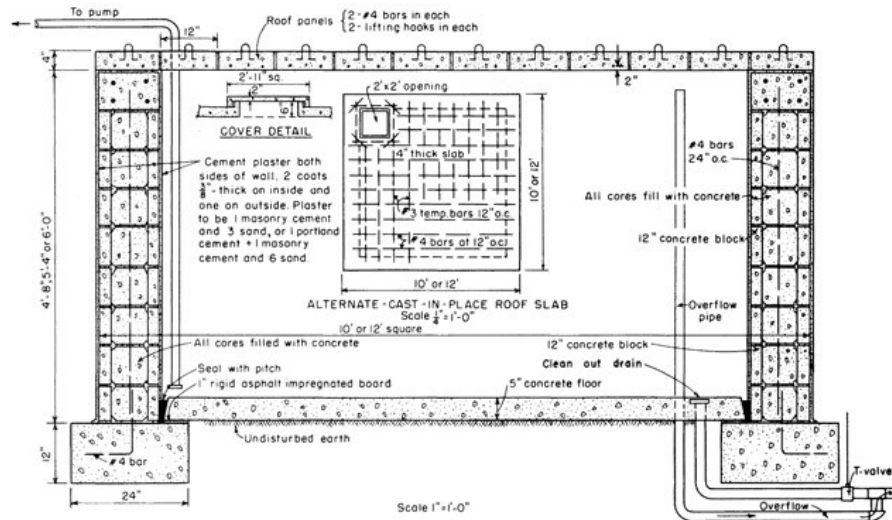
Cross section of a concrete block-walled below ground cistern, showing important features. (Source: Penn State Ag. Ext. Service, Order #800-86 Concrete Masonry Cisterns)
